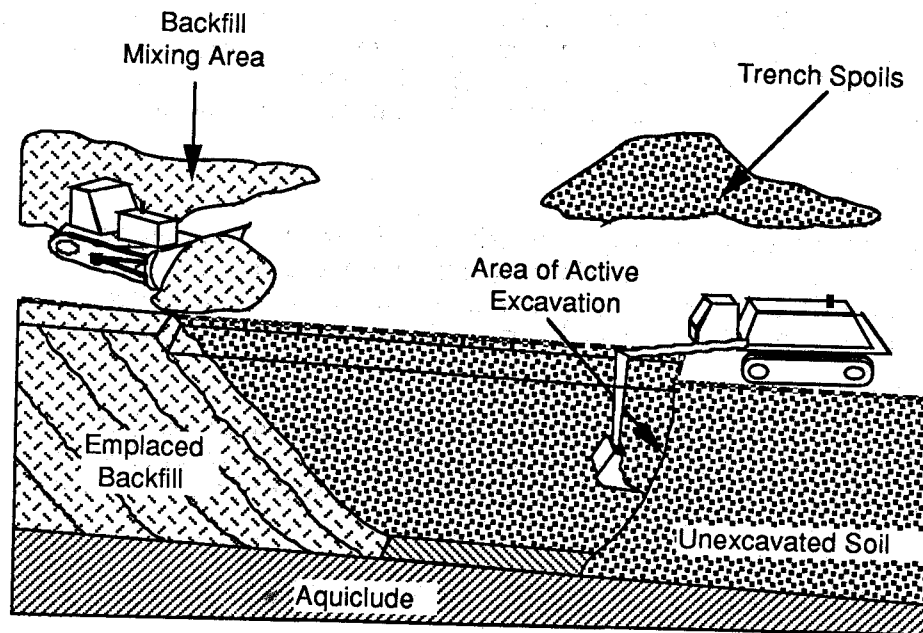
Diagram of Construction Process for Soil-Bentonite-Backfilled Slurry Trench Cutoff Wall.
